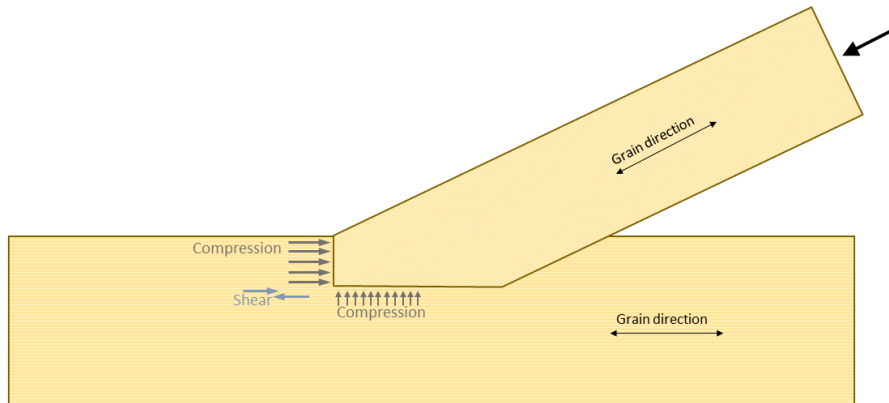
Conceptual figure of a timber connection with induced forces when loaded in compression, without any connector or fastener
